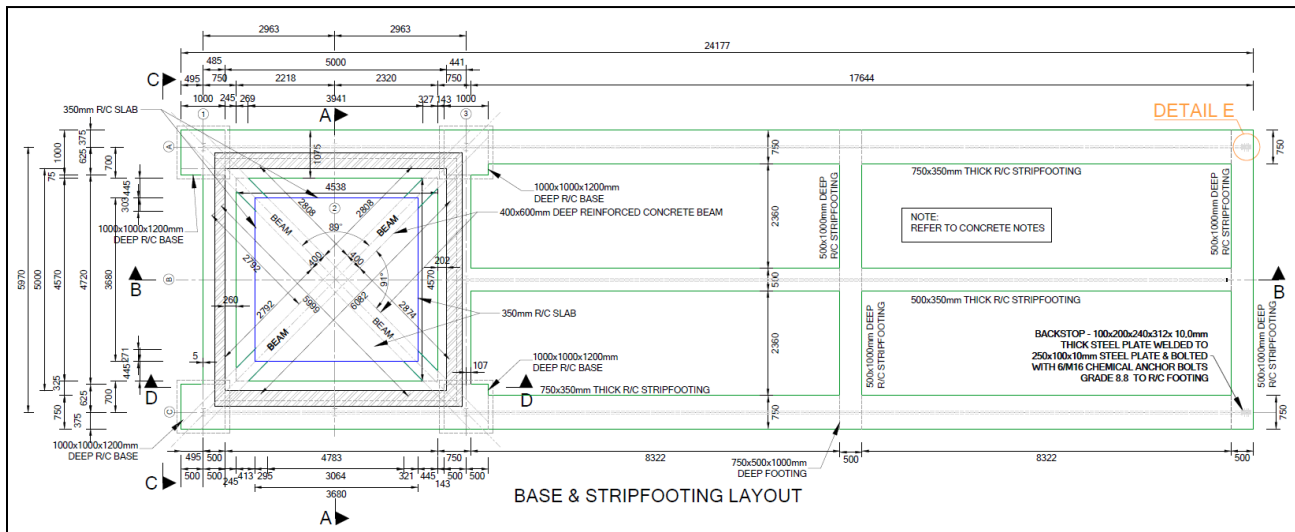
DETAILED DRAWING OF THE BASE AND TRACKS
